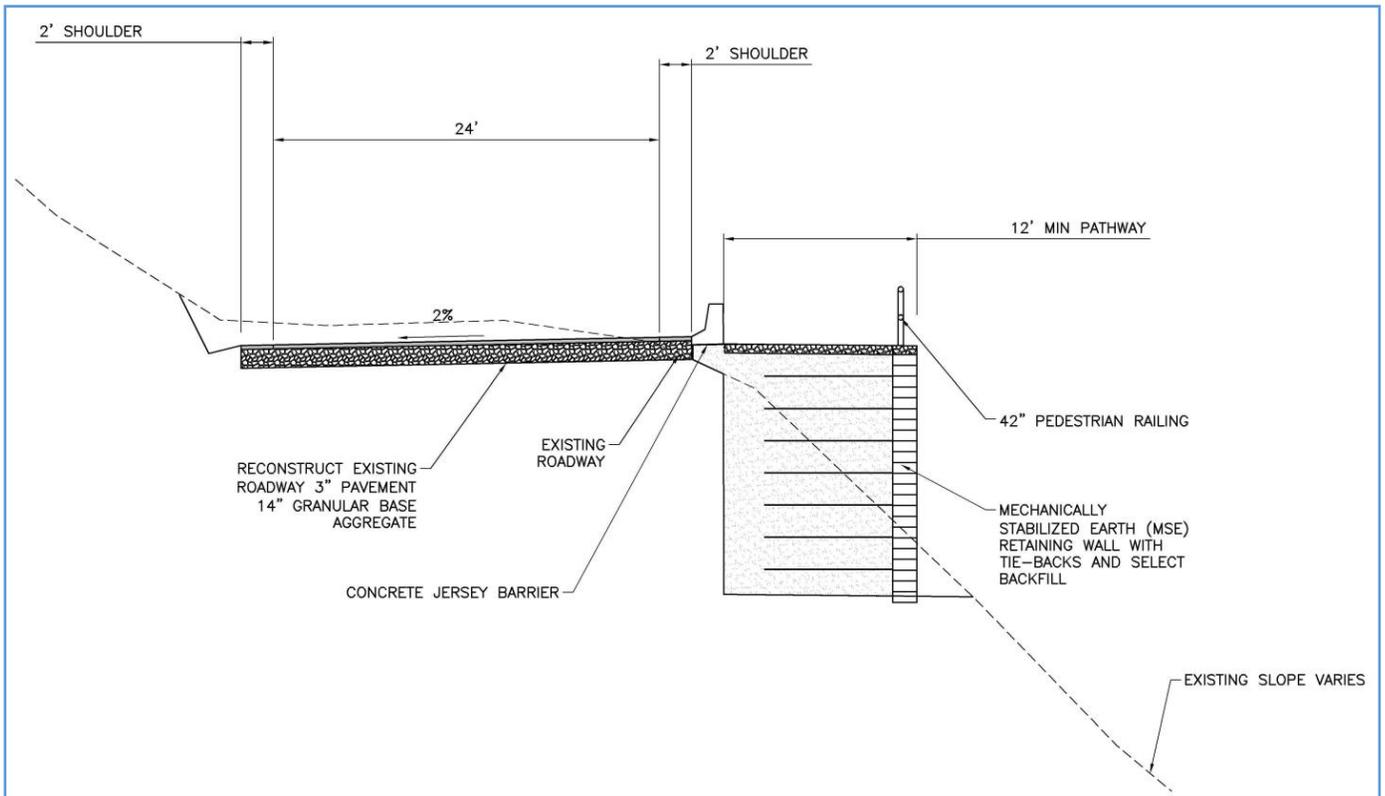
TYPICAL SECTION – RECOMMENDED ALTERNATIVE - LOWER ROADWAY (BELOW UPPER HAIRPIN CURVE)
